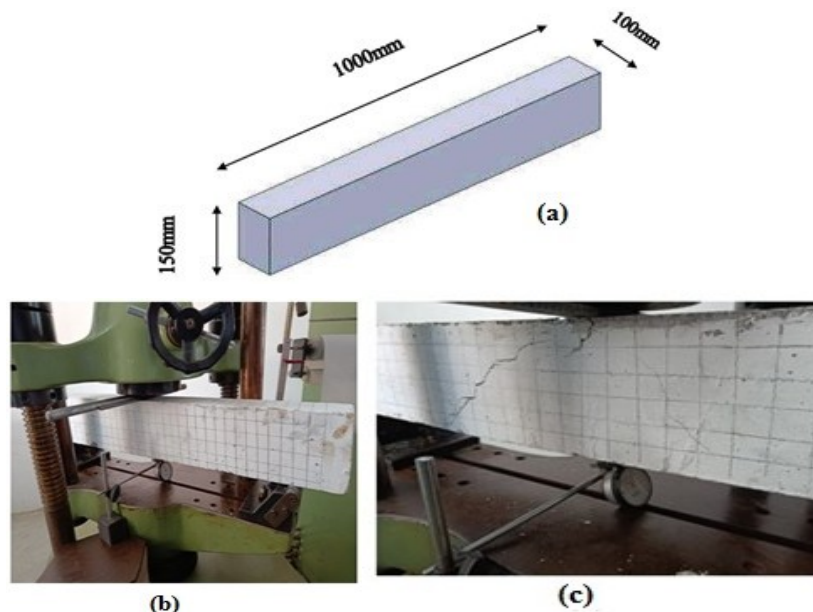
Three-point bending tests on notched specimens: a) geometrical details of the beam; b) test set-up; and c) cracked samples after testing
